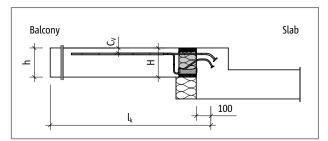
Schöck Isokorb® XT type K-U: Static system
